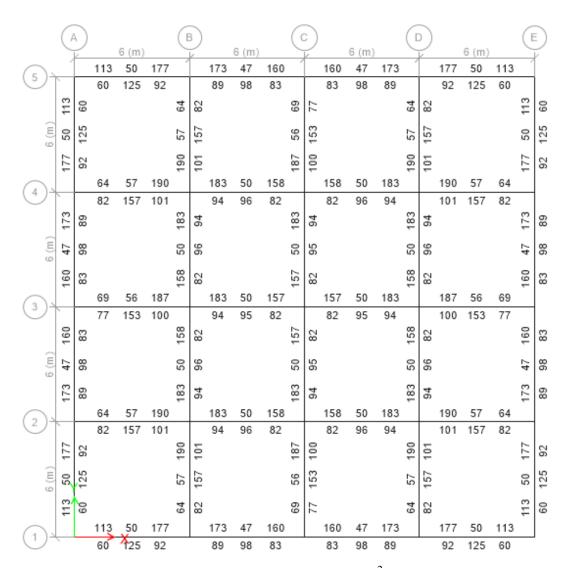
Beams reinforcements (mm<sup>2</sup>) for story 3
